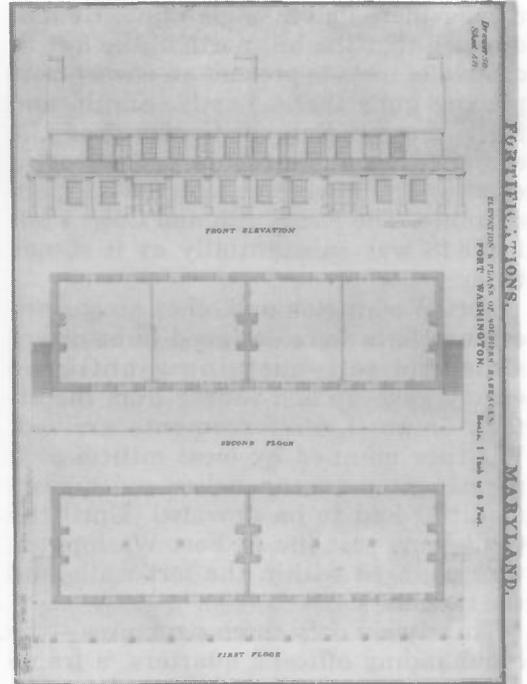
Elevation and Plans of Soldiers' Barracks, Fort Washington, drawn by G. C. Humphries after Samuel Cooper, 1849. This building, with altered porch and interior arrangements, still stands. The interior walls were changed from time to time to accommodate its different uses and tenants. The exterior is similar in design to the Officers' Quarters located near it on the parade. RG 79, NCP 117.8-48, Map Division, NA.
